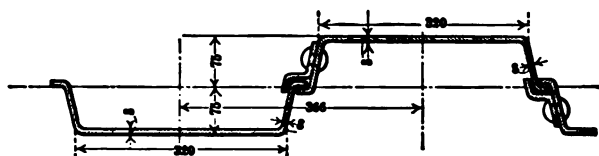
LARSEN'S STEEL SHEET-PILING.
